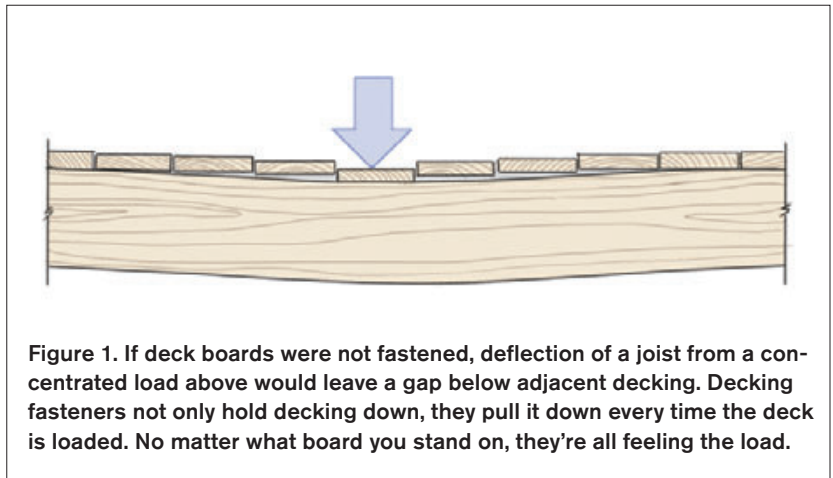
If deck boards were not fastened, deflection of a joist from a concentrated load above would leave a gap below adjacent decking. Decking fasteners not only hold decking down, they pull it down every time the deck is loaded. No matter what board you stand on, they're all feeling the load.
